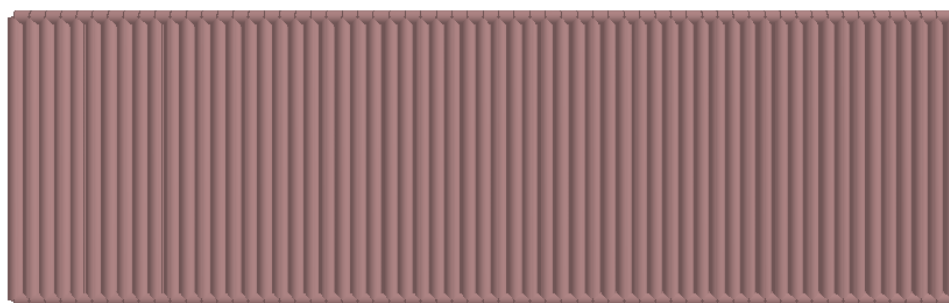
Deck of Pedestrian bridge made up of Bamboo without stiffener
